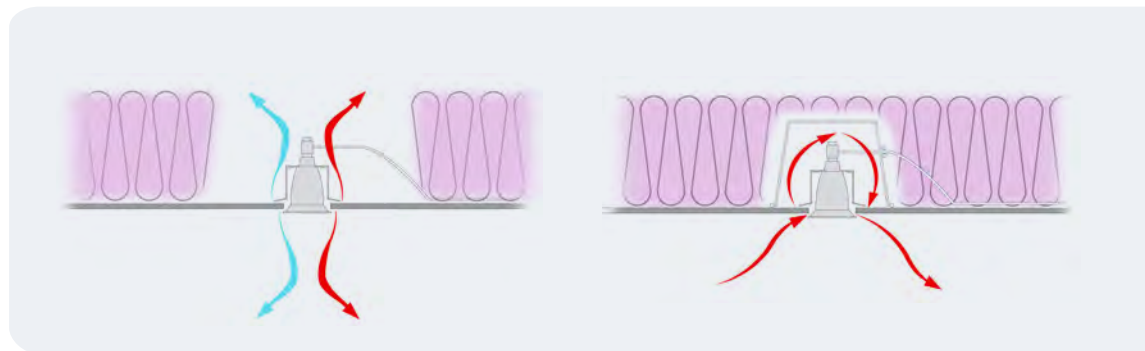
Seal downlights. Beware unwanted air movement through vented downlights.
